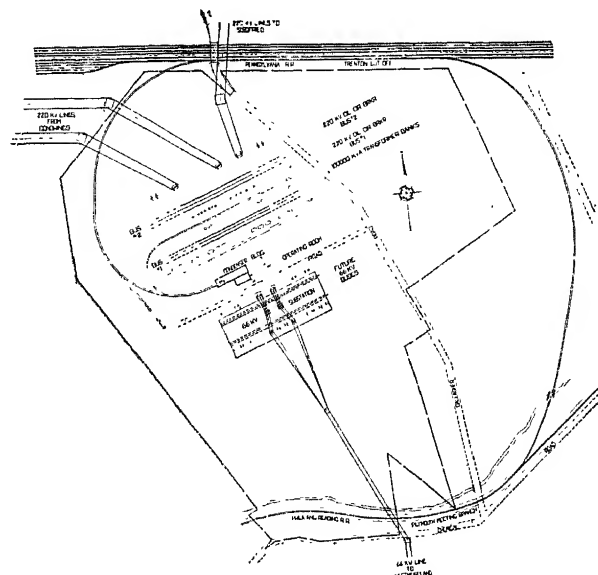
PLOT PLAN OF THE PLYMOUTH MEETING SUBSTATION
